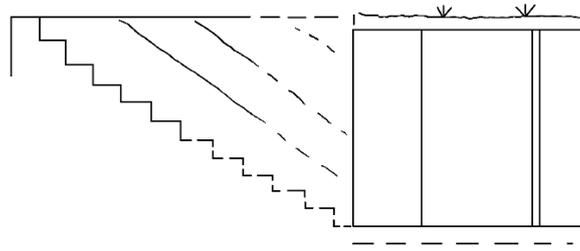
WWII Air Raid Shelter Elevation 2 (1:50)
